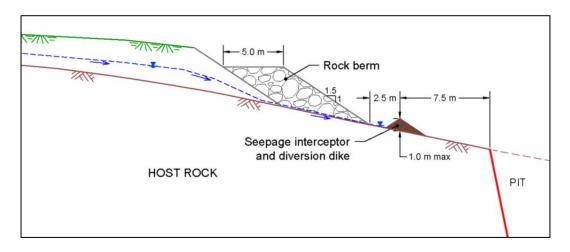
Typical Cross-section Showing a Berm for Diverting Water
